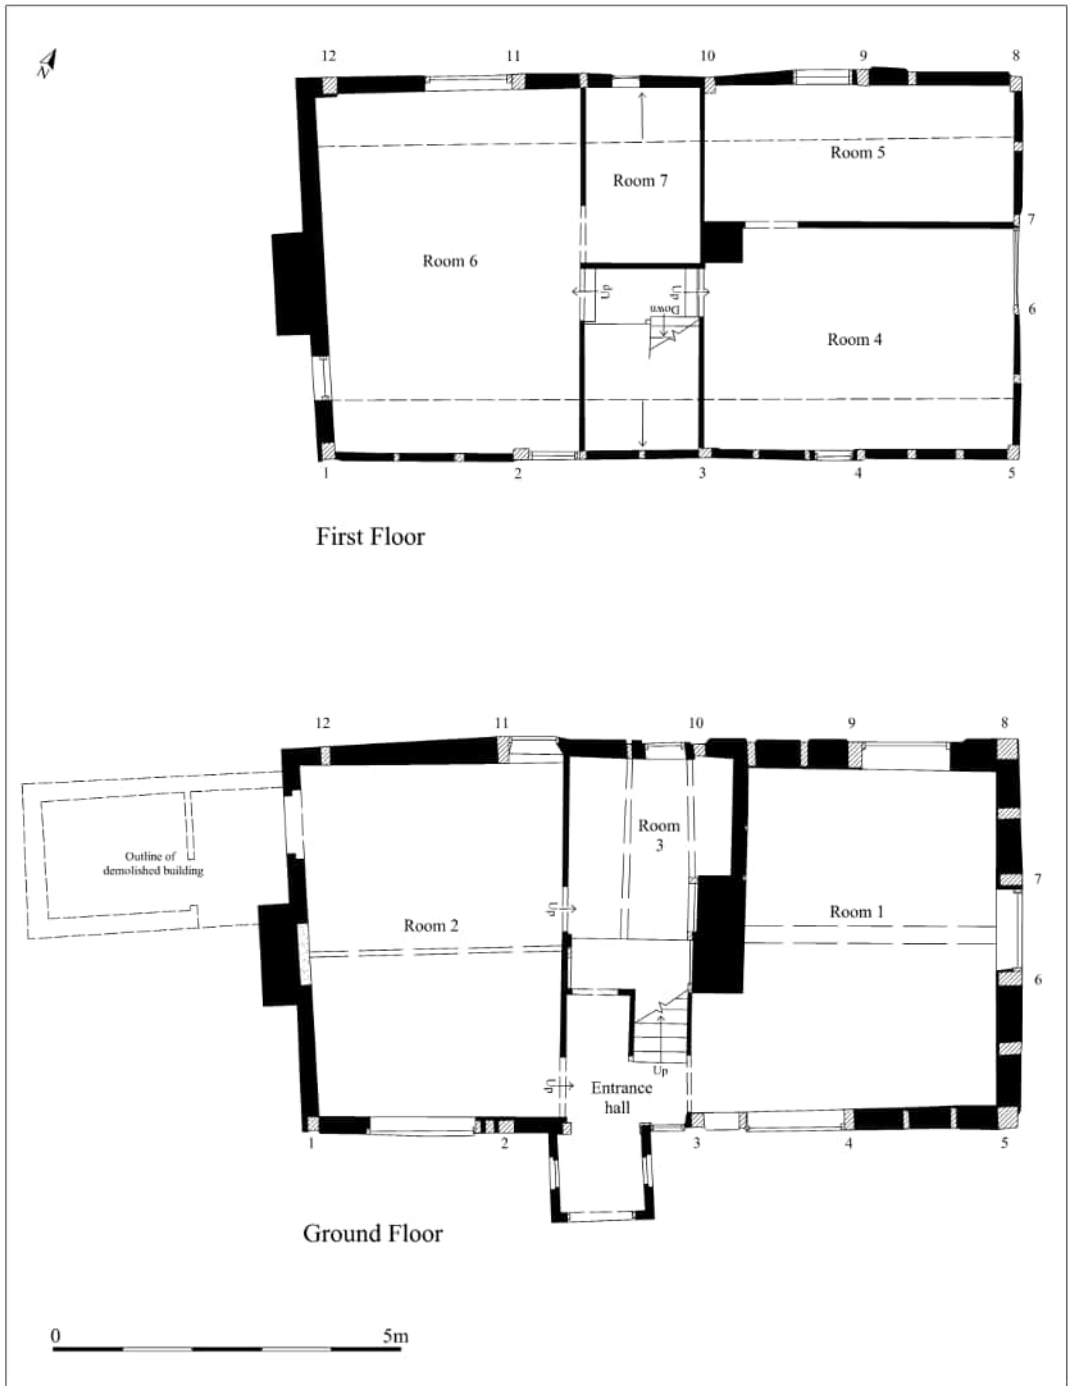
Cottage at Wood End, Nash: Floor Plans
